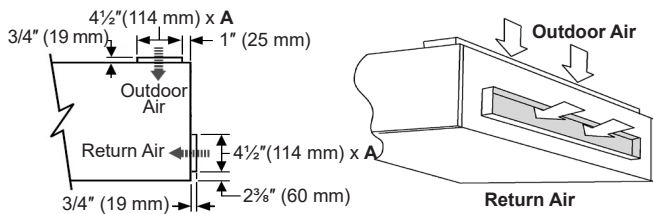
Arrangement 29 Return Air Rear Duct Collar/Outdoor Air Rear Duct Collar
